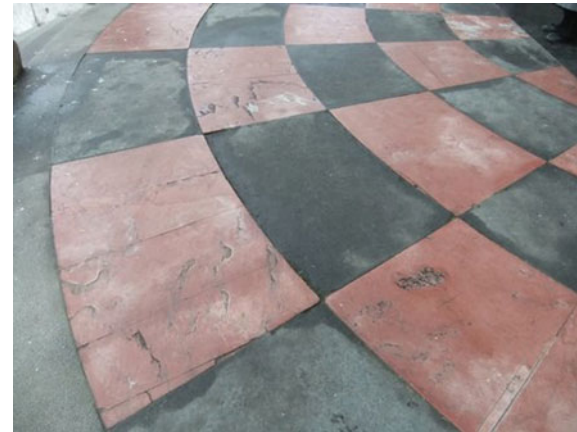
St Paul's Cathedral, London. South portico pavement.
